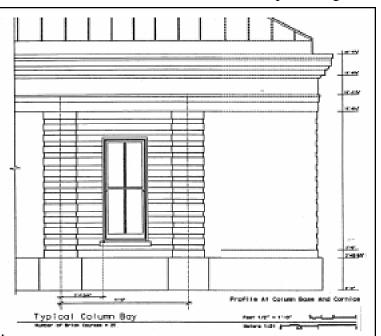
Typical column bay, Drainage Pumping Station No. 6. The bay proportions are uniform for Drainage Pumping Stations 1, 3, 6, and 7 (from Historic American Buildings Survey 1992).
